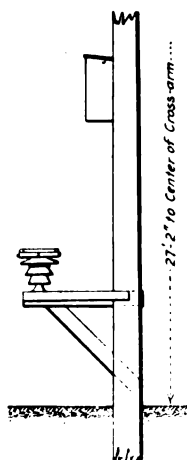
WASHINGTON WATER POWER CO. DETAIL OF
